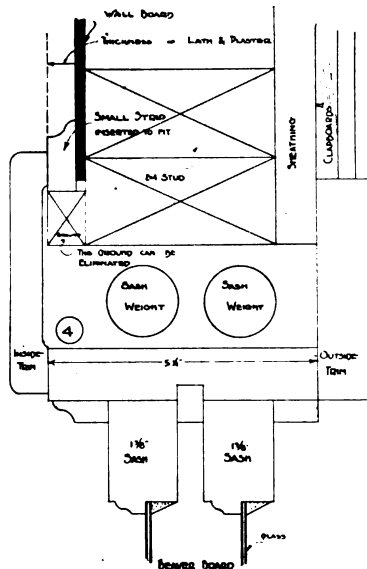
This shows how wallboard can be used with a window frame intended for lath and plaster. A small molded strip, cut to fit, fills the opening between wallboard and frame.
